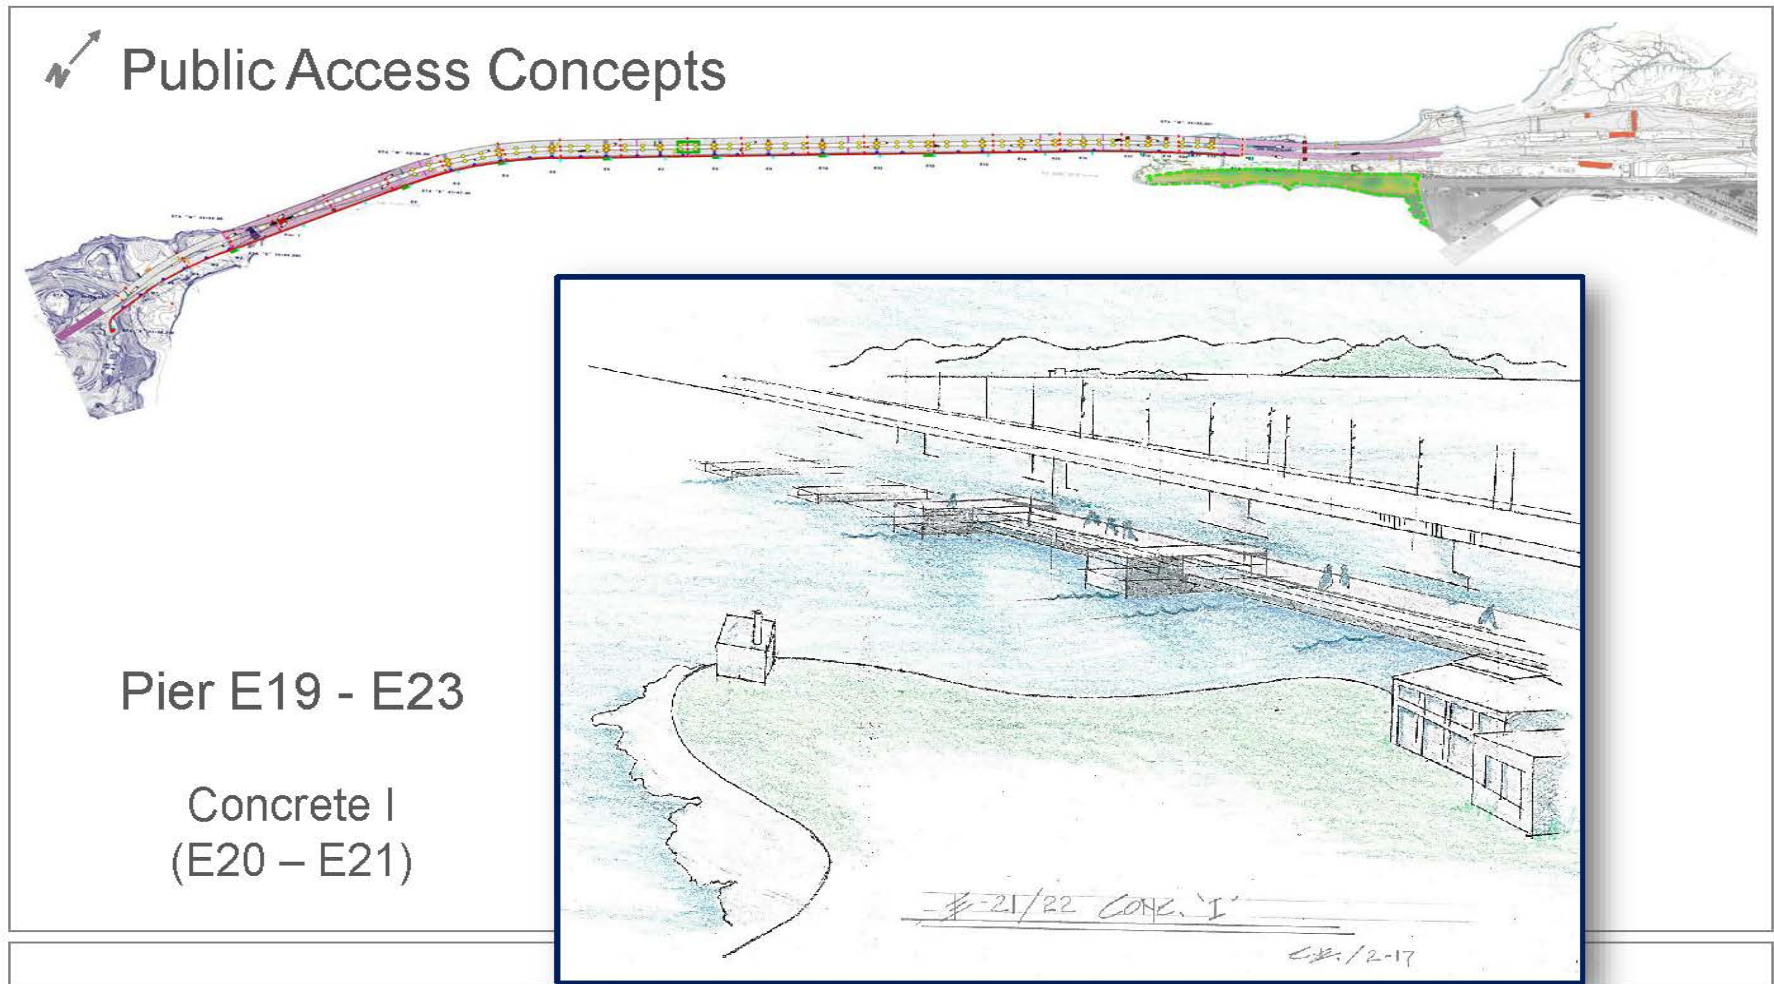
Conceptual Plan of Precast Box Girder Bridge Piers E21 and E22-OTD Alternative 1
